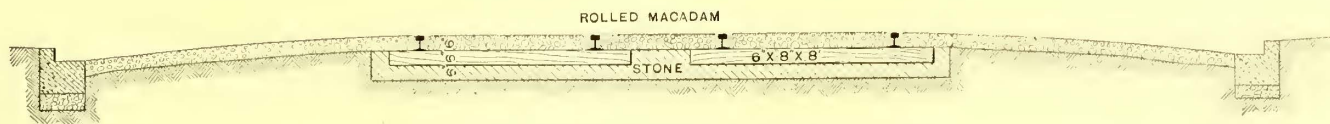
SECTION OF TRACK ON MACADAM STREETS
